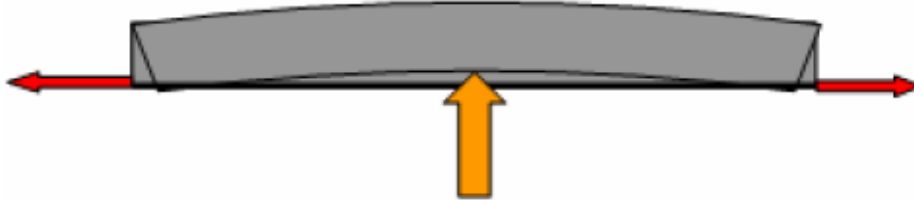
Prestresses the sheet by cambering the flexural members
